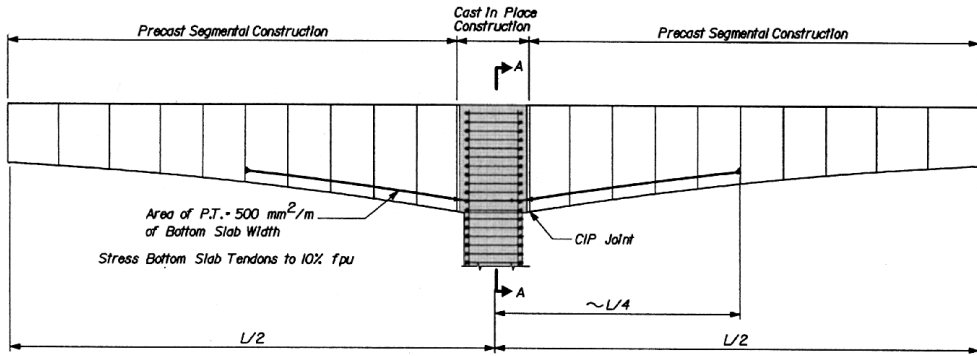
Deck/pier connection with cast-in-place joint.
